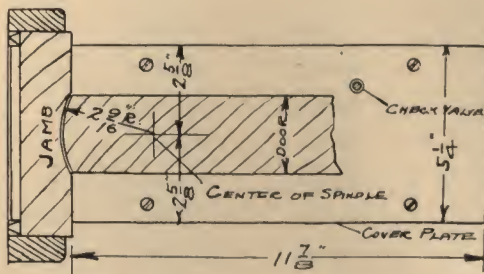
# DETAILS FOR APPLICATION OF RUSSWIN CHECKING FLOOR HINGES
